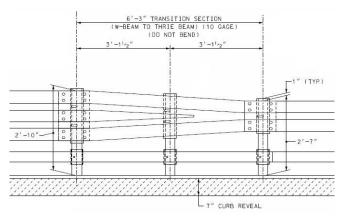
NHDOT T4 AGT symmetrical w-beam to thrie-beam transition section (VTrans similar except bottom bar and height).
